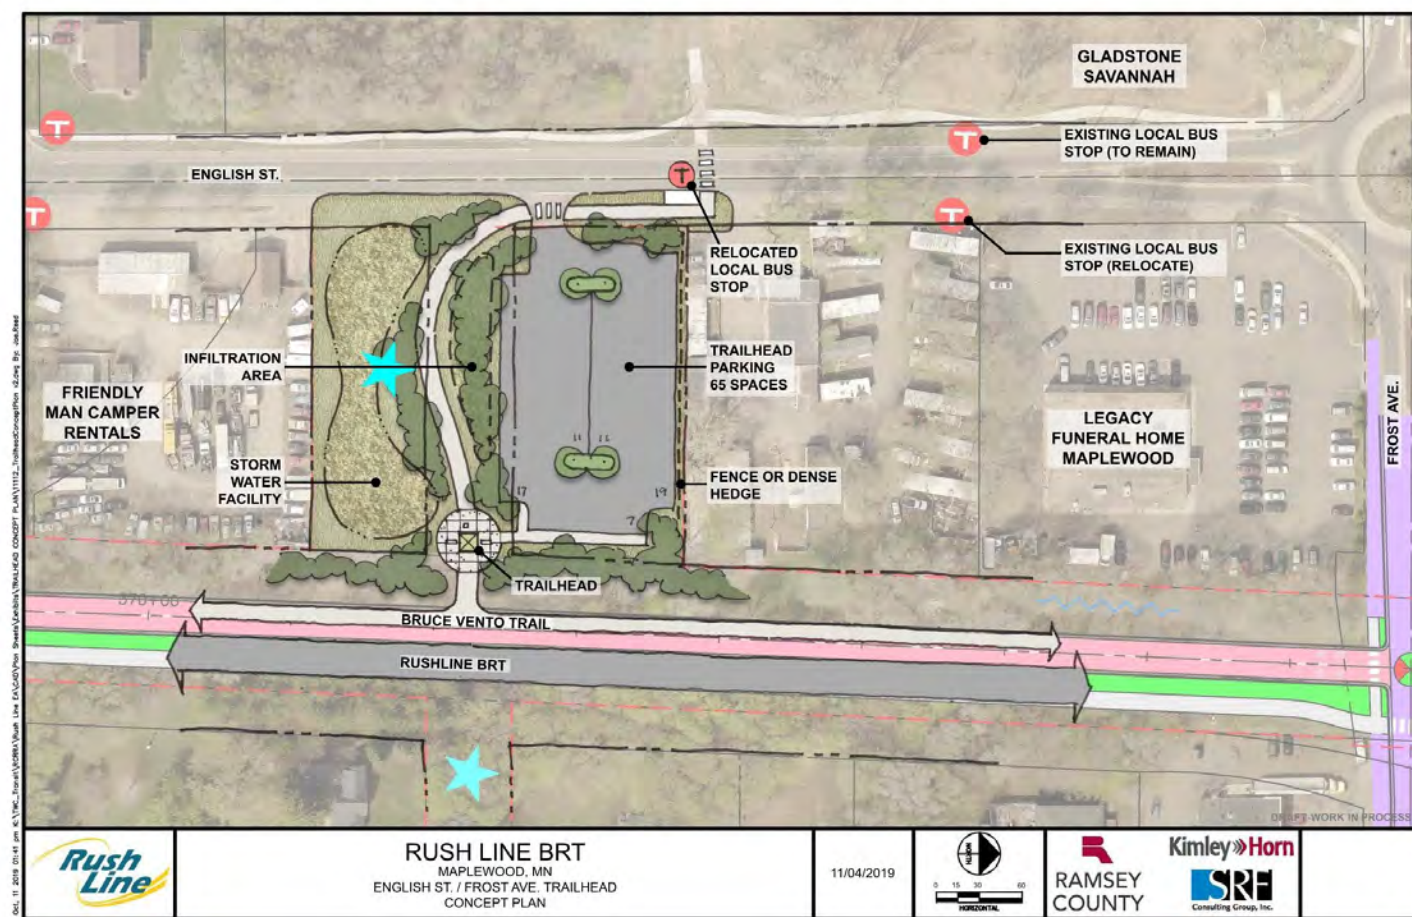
Rush Line BRT Concept Plan for a Potential Bruce Vento Trailhead Site Located South of Frost Avenue and East of English Street
